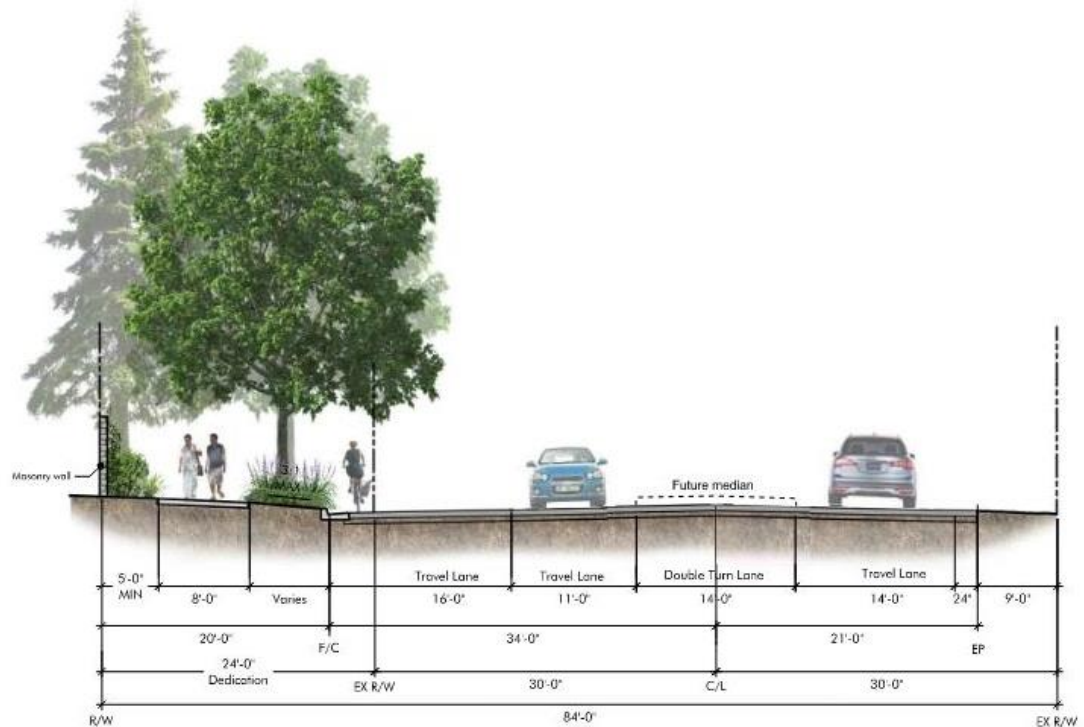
84' Austin Road – Adjacent to Proposed Development
